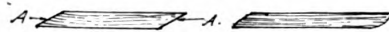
Bridging Should be Carefully Cut With Correct Bevel
